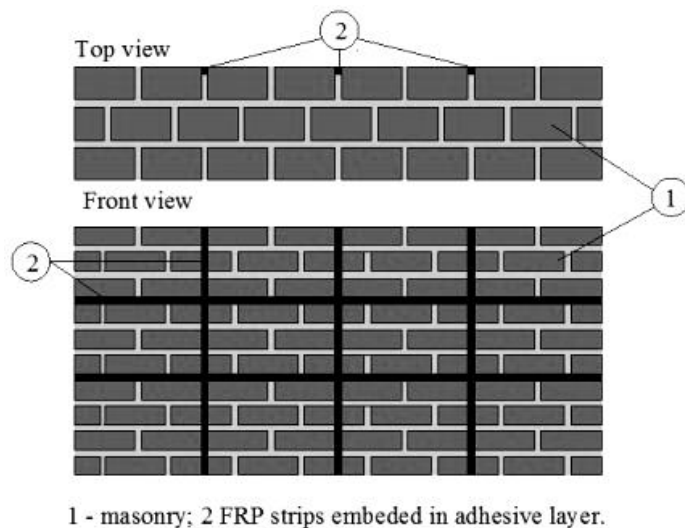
Near surface mounted strengthening system applied to an URM wall [19]
